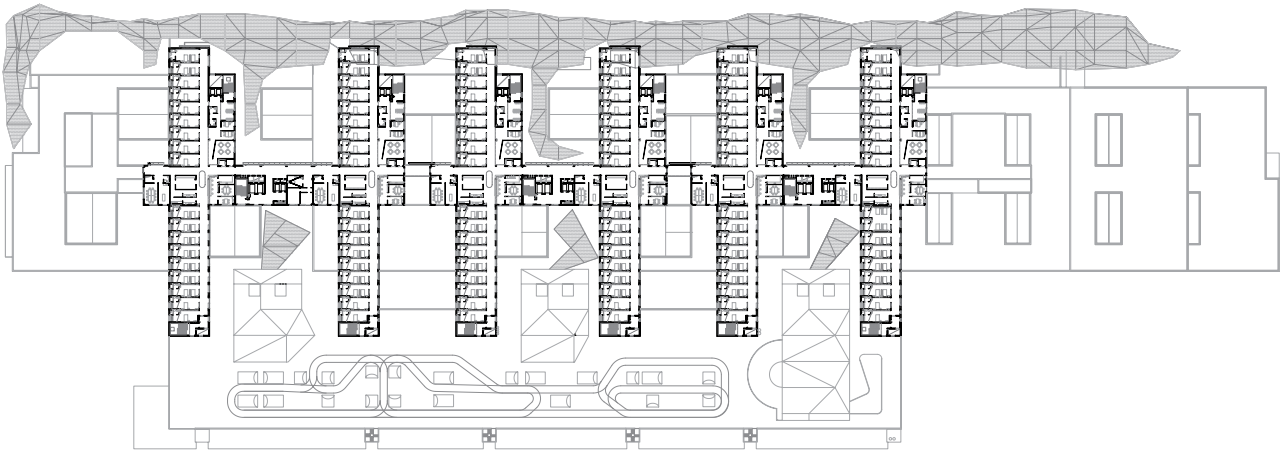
Fourth floor plan—bed units. Source: CASA Solo Arquitectos SLP
